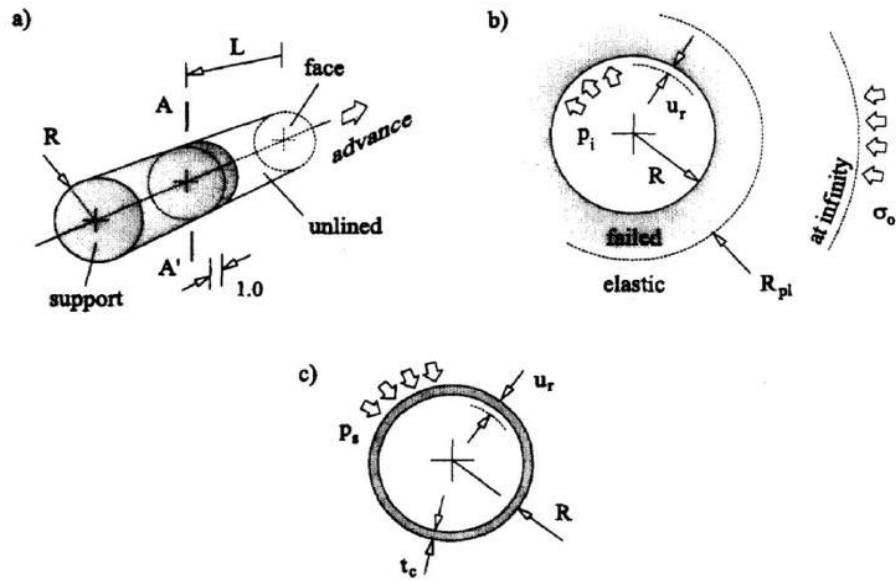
Cylindrical tunnel of radius r driven in rock mass, b) Cross-section of rockmass at section A-A' c) Cross-section of circular support at section A-A'
